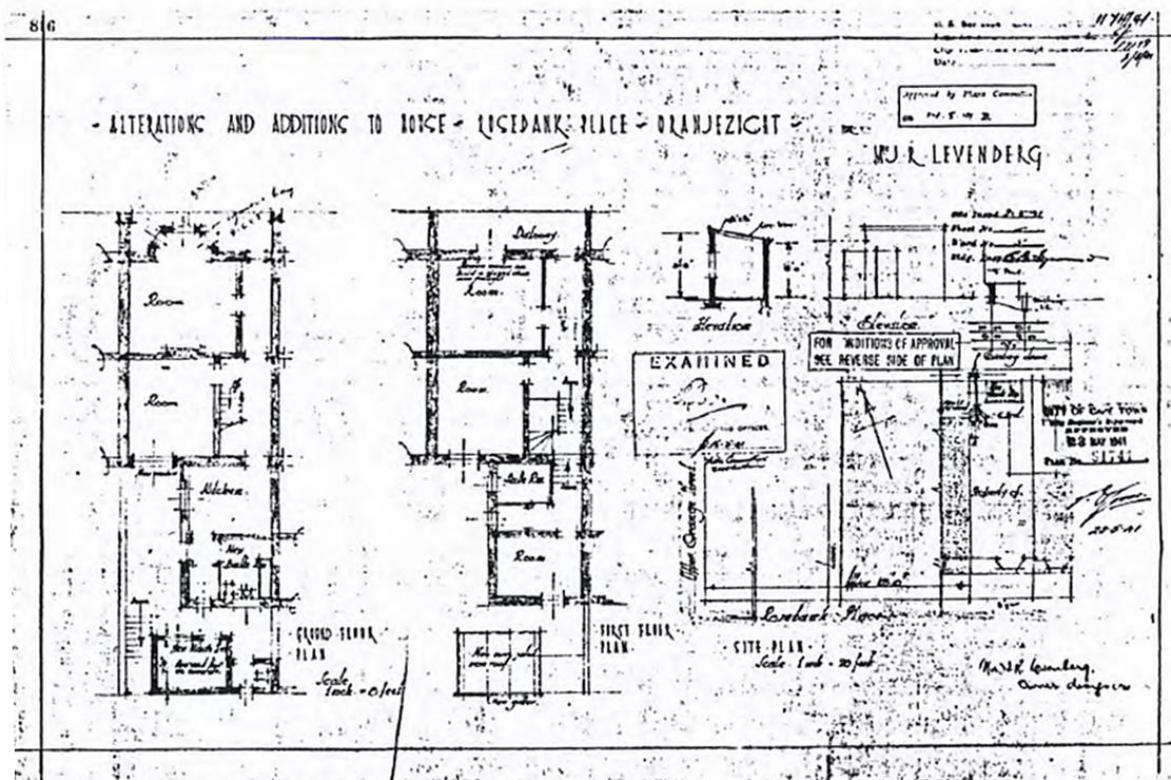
Plan for 1941 alterations to Erf 459 – 5 Rosebank Place.
